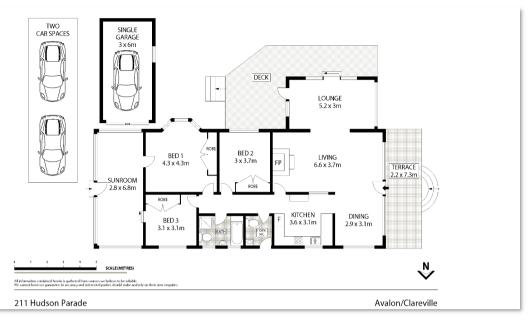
FLOOR PLANS FOR 211 HUDSON PARADE
